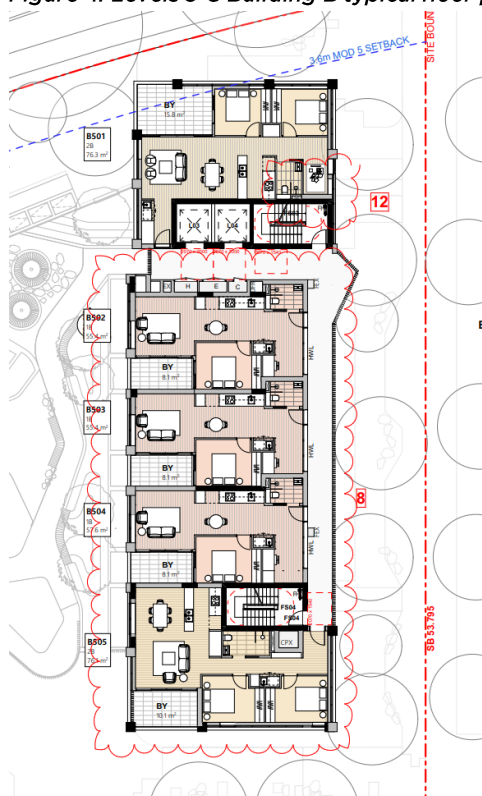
Levels 3-8 Building B typical floor plan (As Amended)
